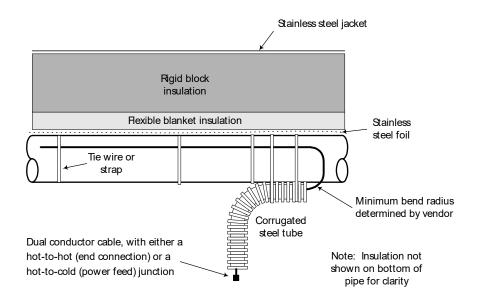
Heat Trace Arrangement on Pipe at End of Zone
